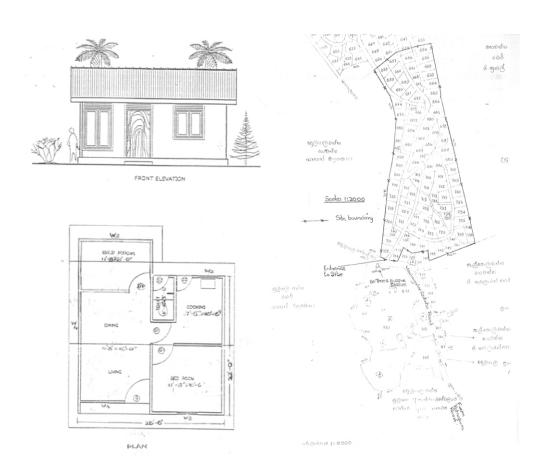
Information on the floor plan and sites from GoSL (I-FREED, 2005)
